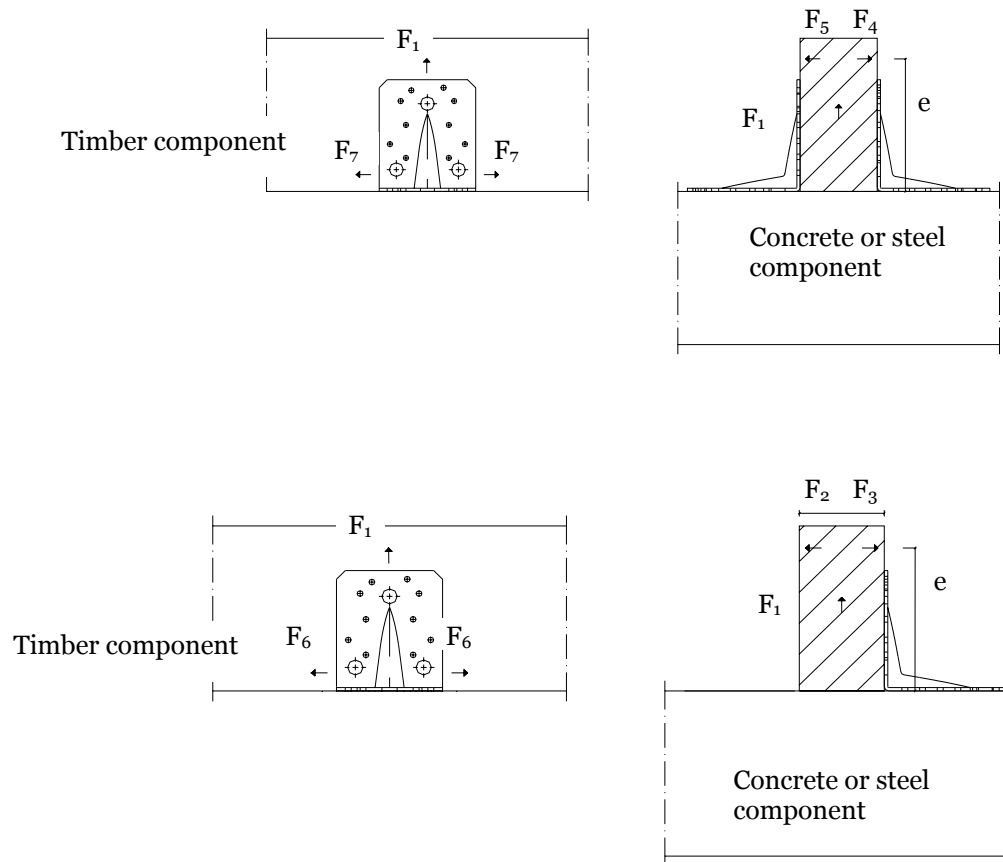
Definitions of forces, their directions and eccentricity for timber to concrete and timber to steel connections
